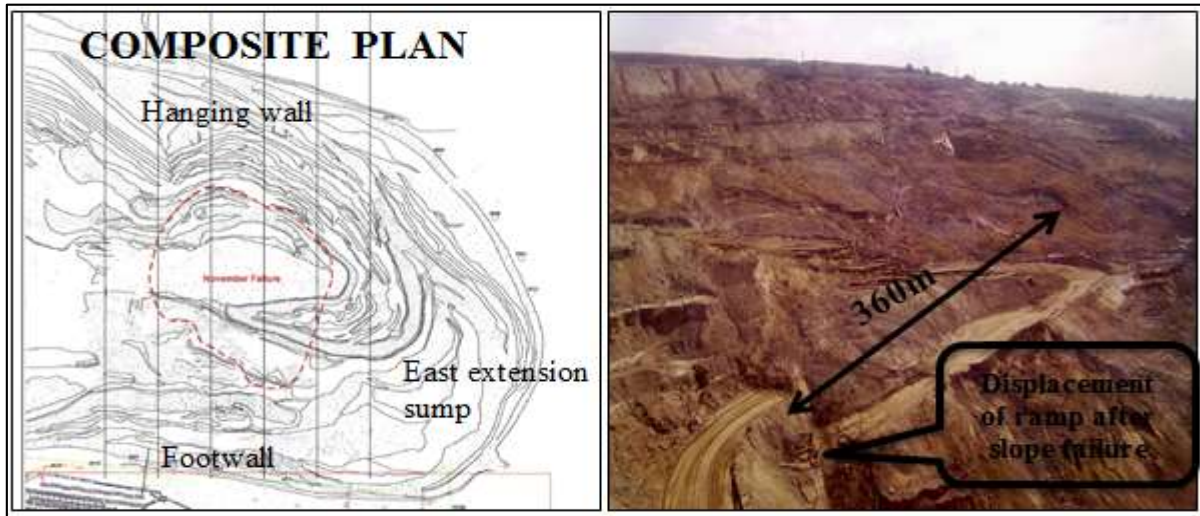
Plan and pictorial view of Nchanga Open Pit Slough zone of November 2014
